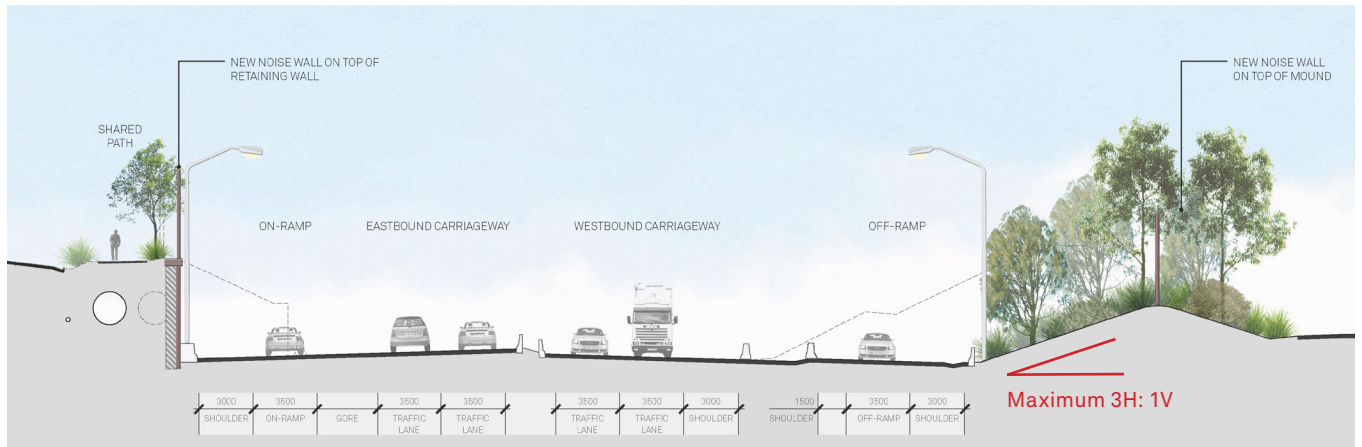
Concept Design Cross Section 3: Typical cross section. The proposed motorway earthworks modifications should not to exceed 3H:1V.
